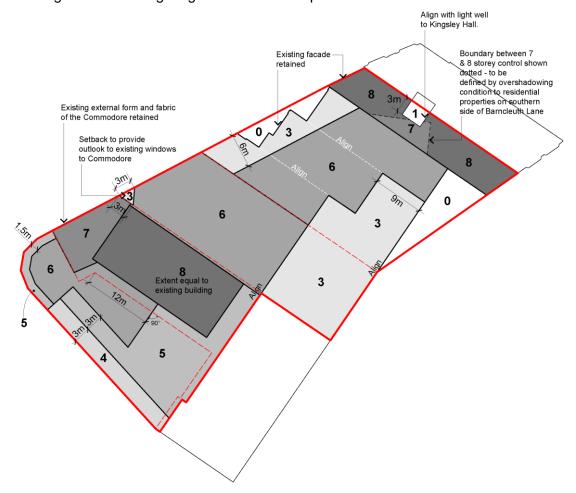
Building heights and setbacks plan (maximum heights noted in storeys)
